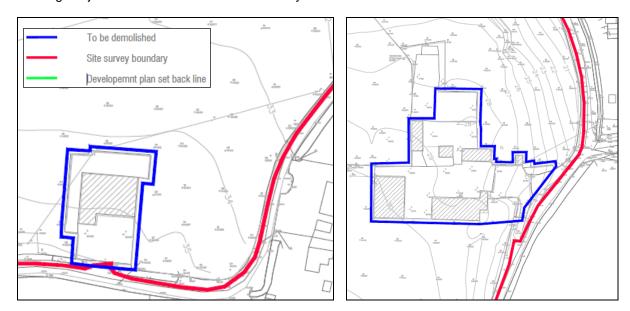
Excepts from the Site Location Map, prepared by NDBA Architects, indicating the existing farm buildings on the site's southern boundary (left) and eastern boundary (right) proposed to be demolished
